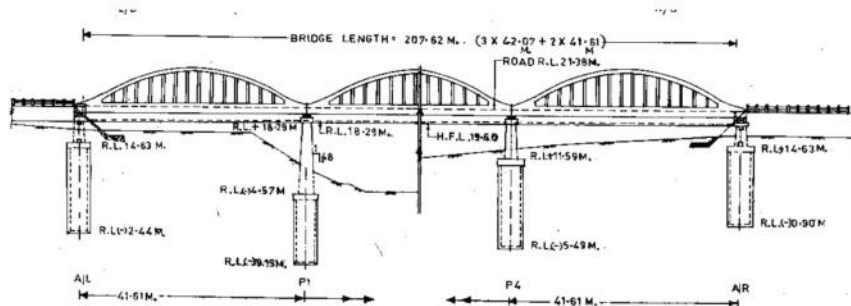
Schematic Elevation of a Bow String RCC Arch Bridge
